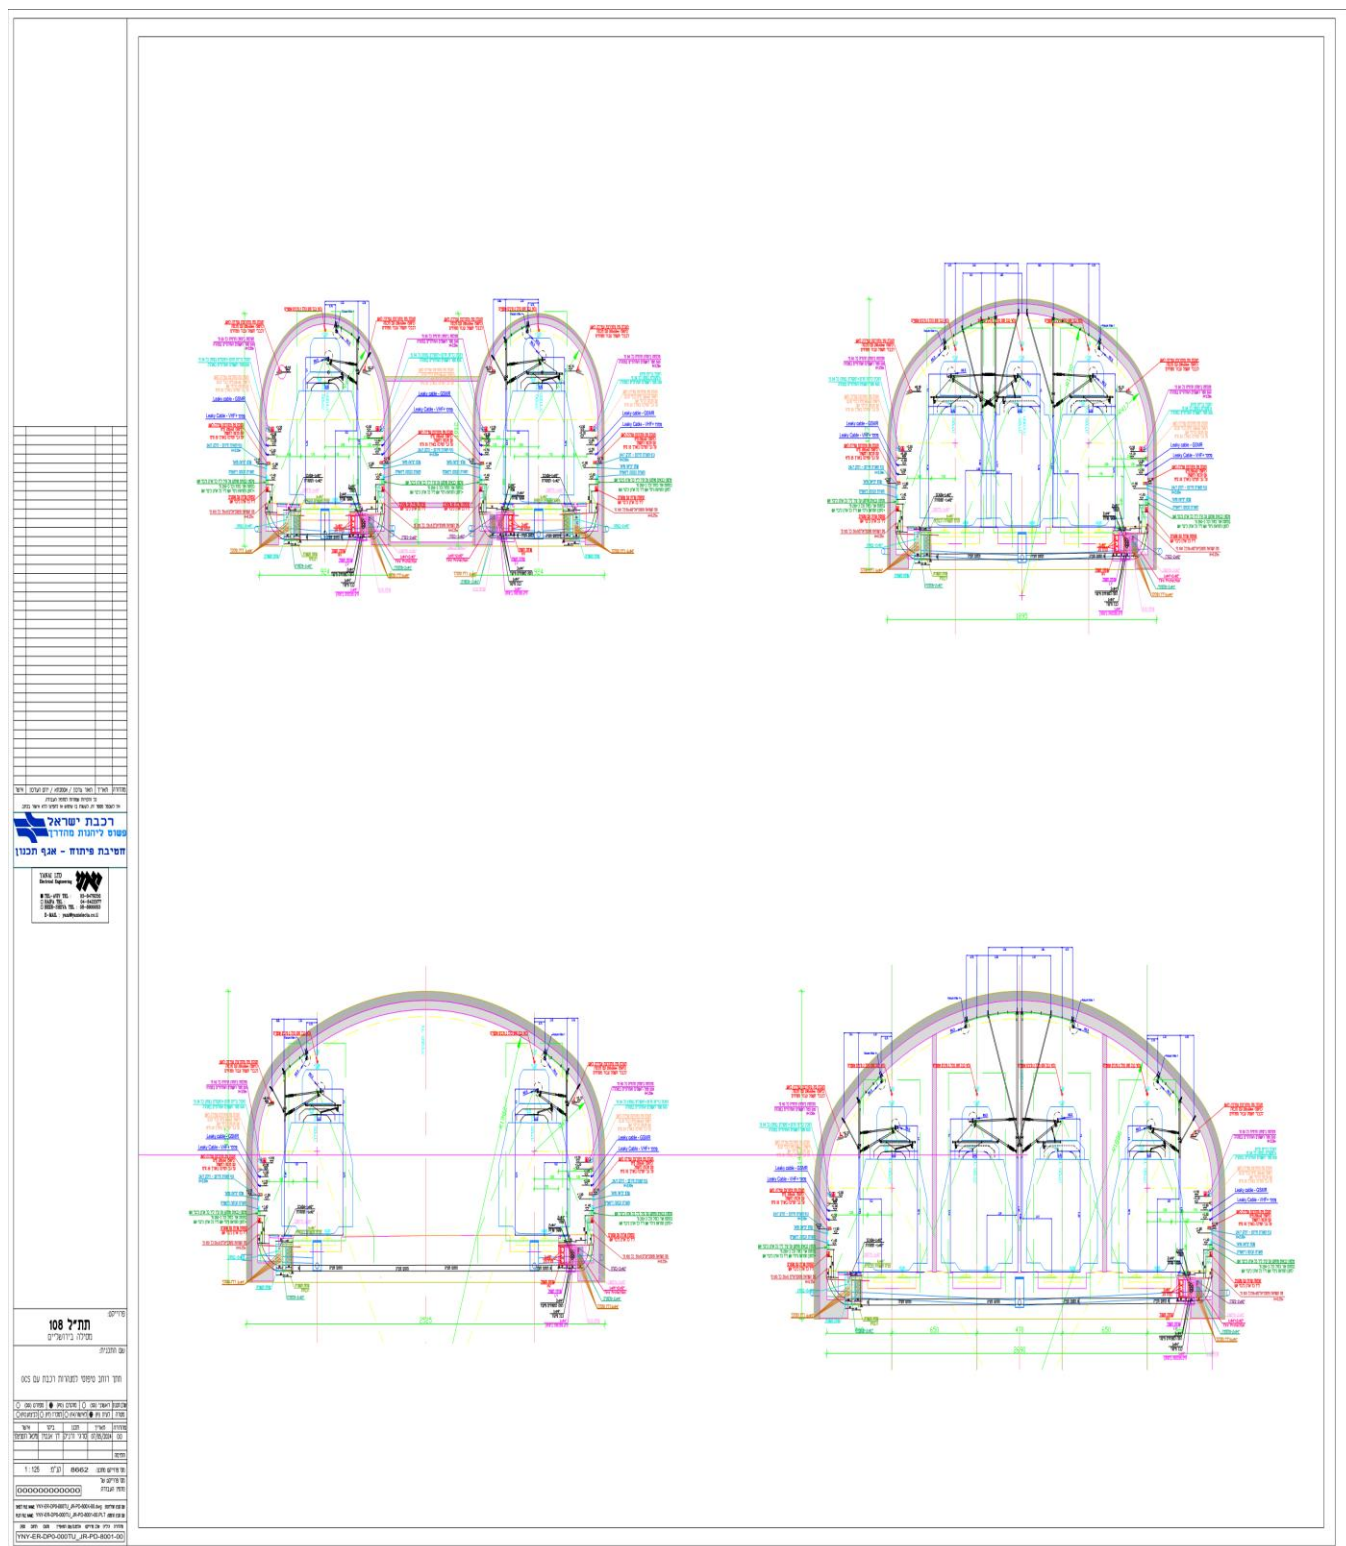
TUNNEL TYPICAL CROSS SECTION
